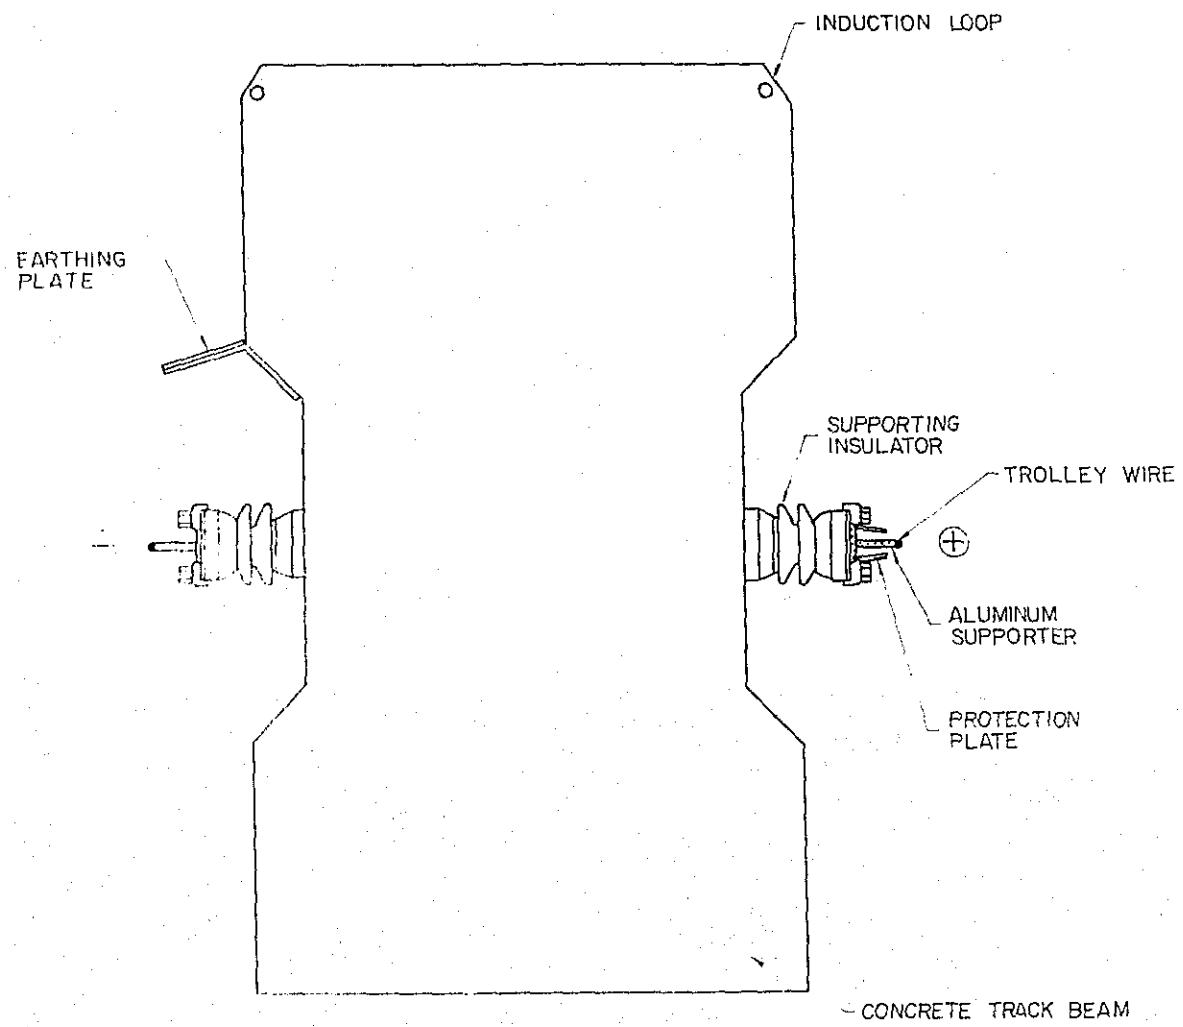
(2) INSTALLING OF ELECTRIC POWER SUPPLY IN RAIL AND EARTHING PLATE
